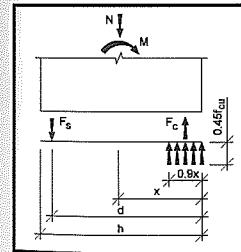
Design Principle Of Cantilever Precast Concrete Walls
